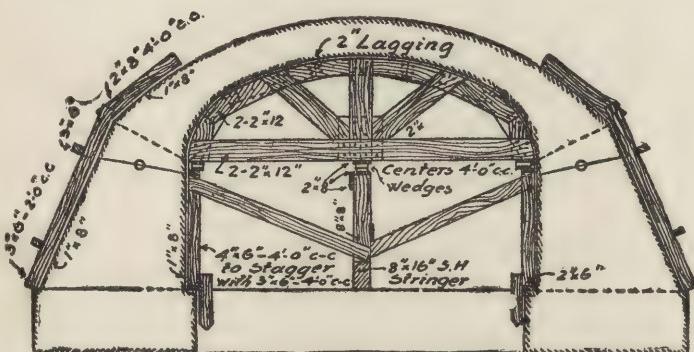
Cross-Section of Concrete Arch Culvert, Showing Forms.
